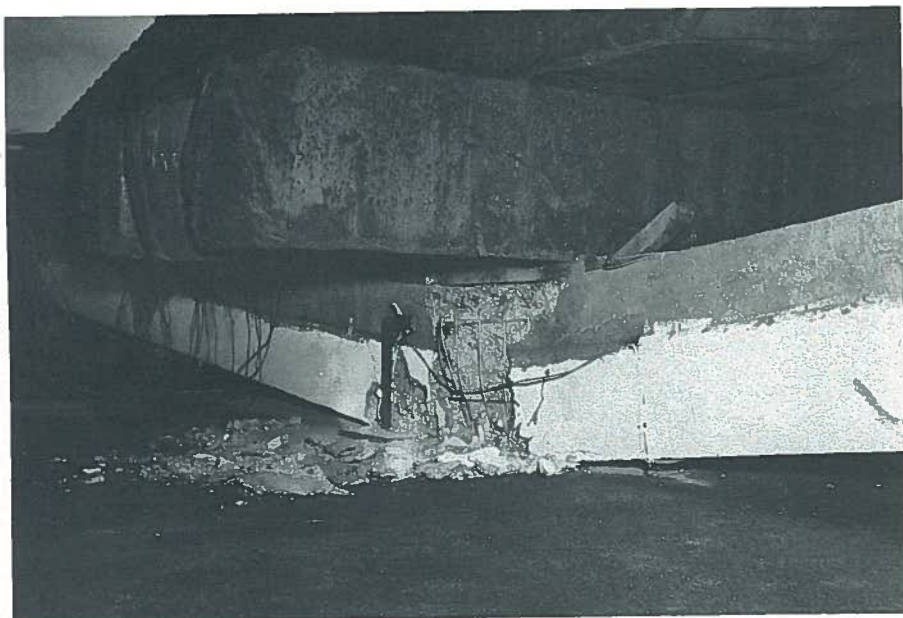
Closeup of fracture. Note wires leading to strain gages on beam. (Pottstown prototype girder.)
